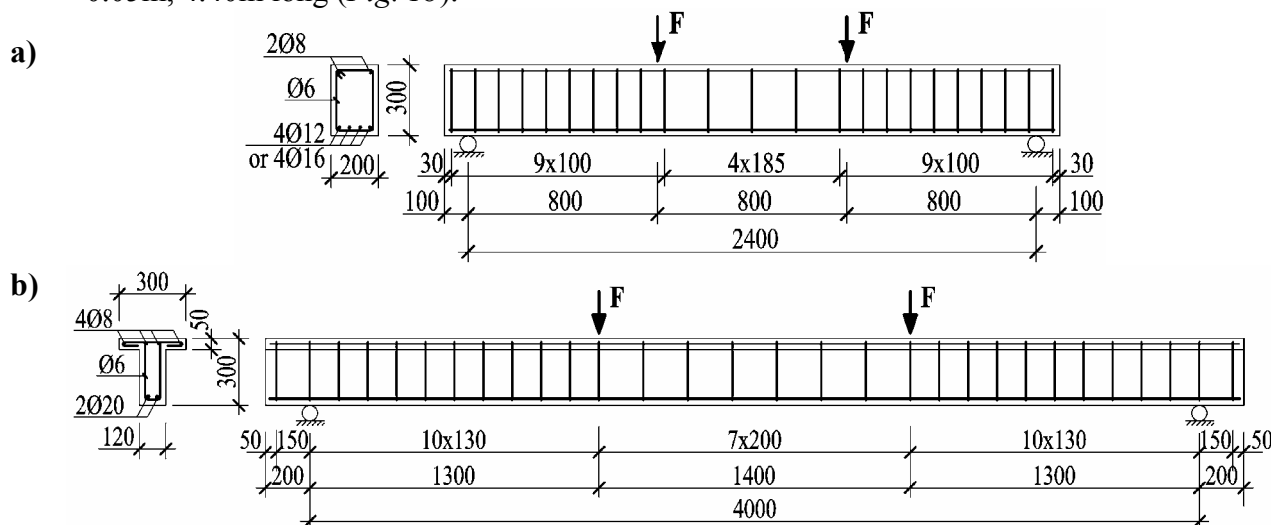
Dimensions and reinforcement of beams in tests (in mm): a) prismatic beams, b) T-beams
